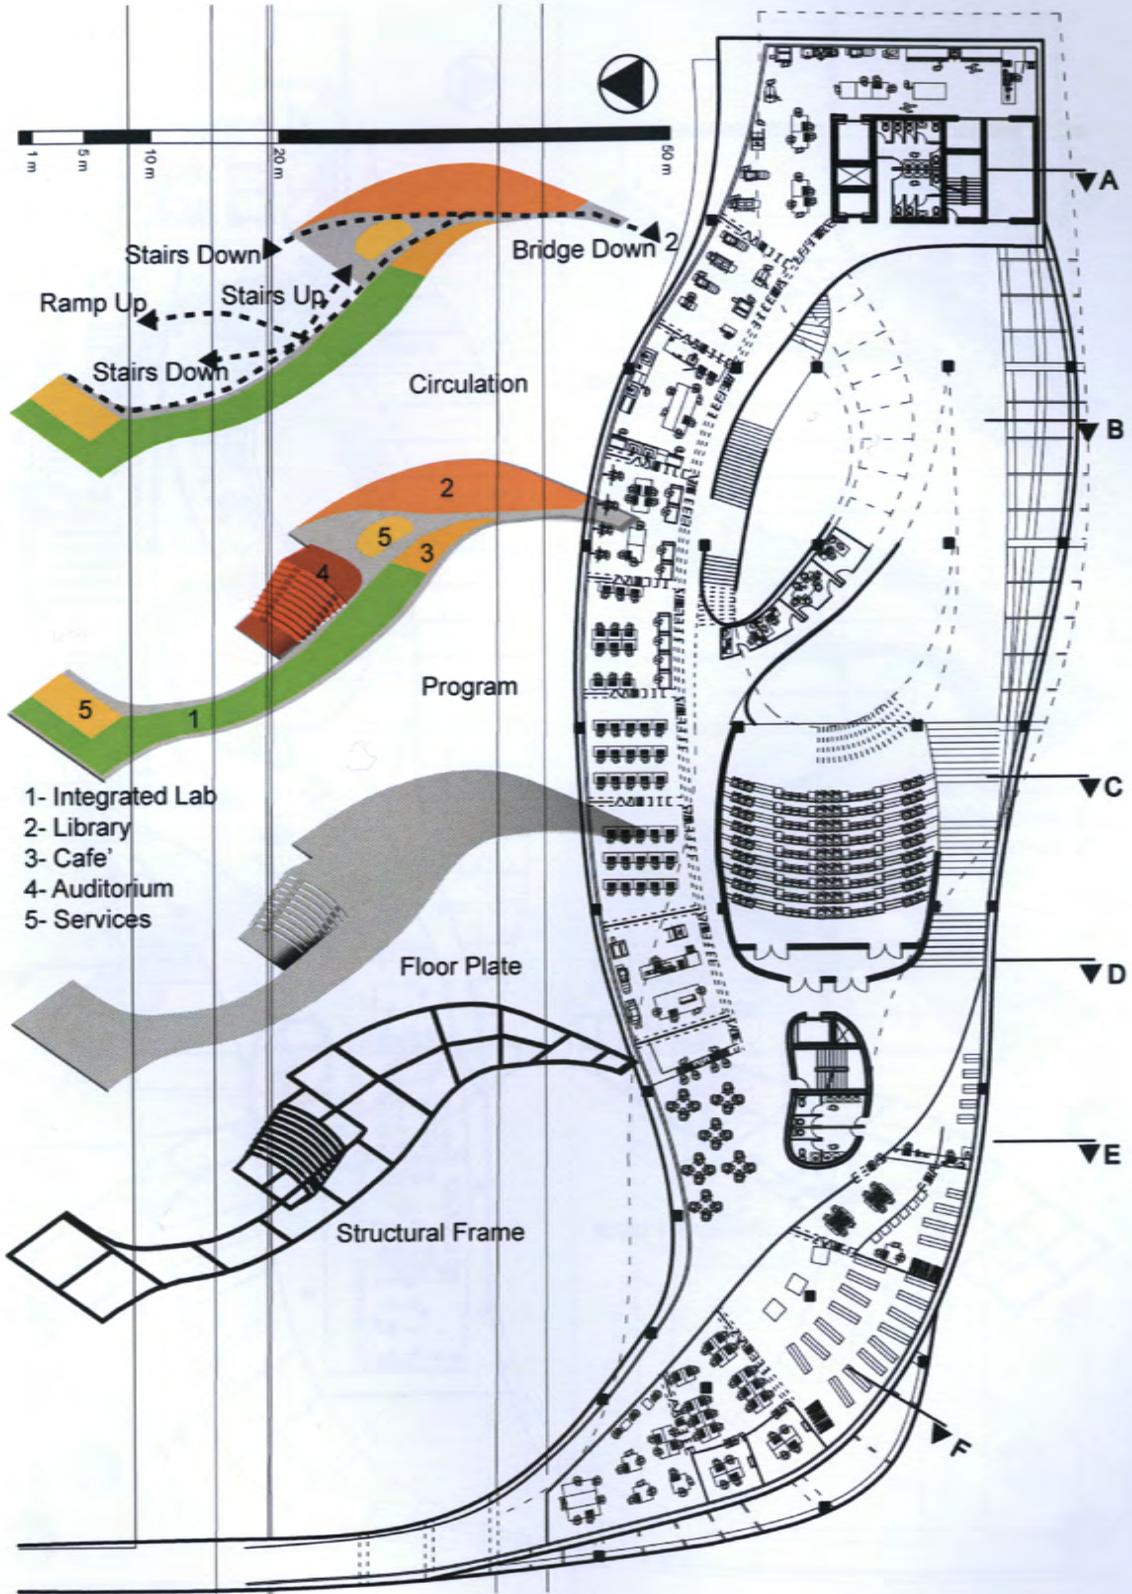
Floor plan of level three- Public Street, Integrated Labs, and Specialized Labs
